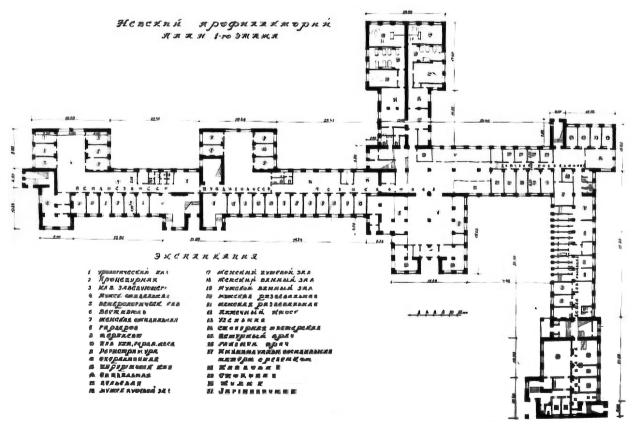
Nevsky Preventorium. Plan of the first floor [12]
